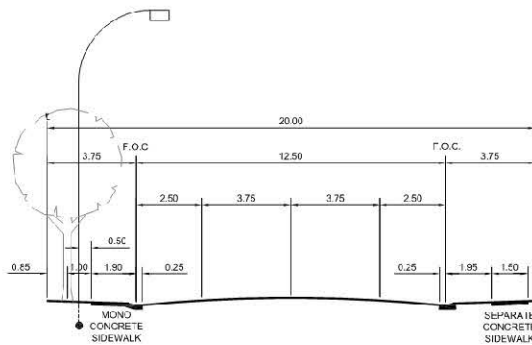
20 m Collector ROW Cross Section Existing Development
